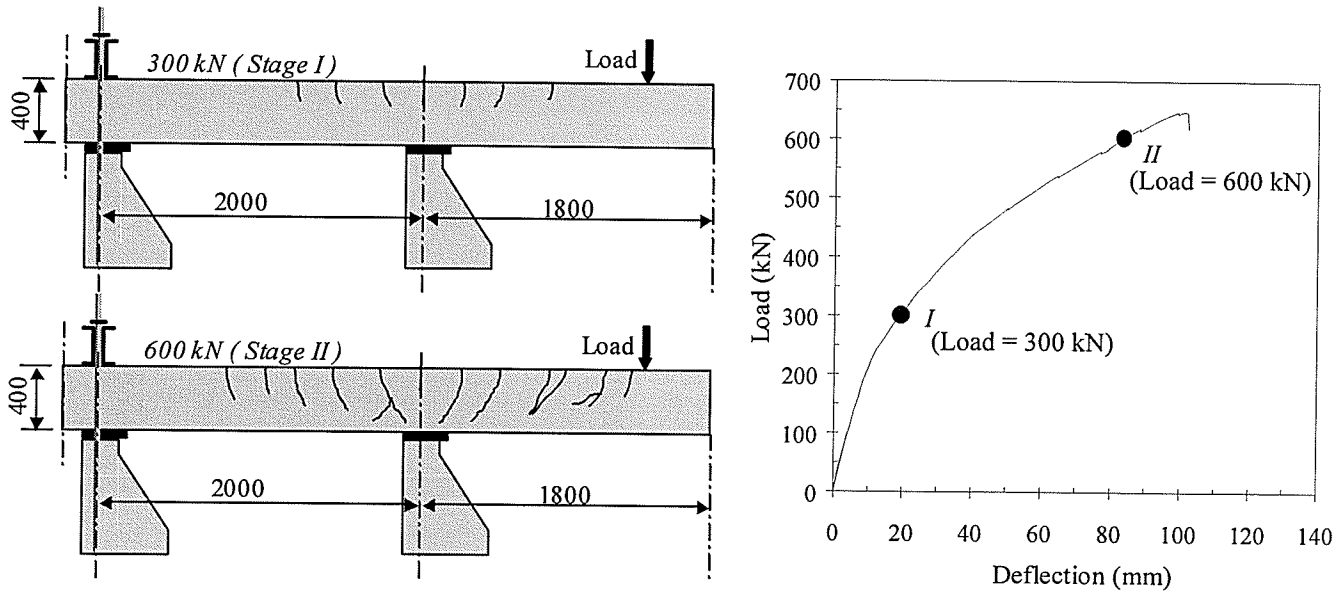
Typical crack pattern development for strengthened cantilevers
